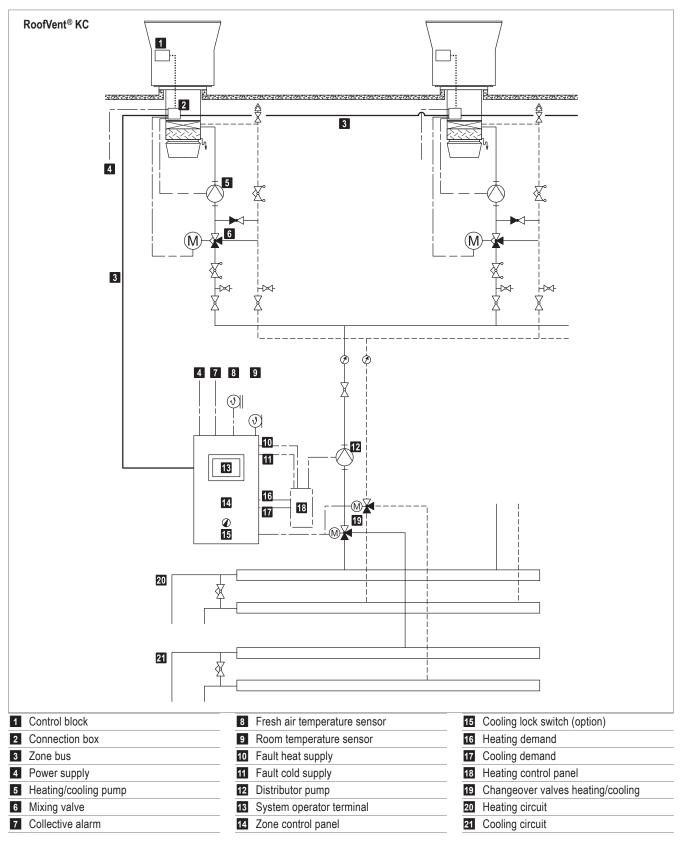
Schematic diagram for mixing system RoofVent® KC
